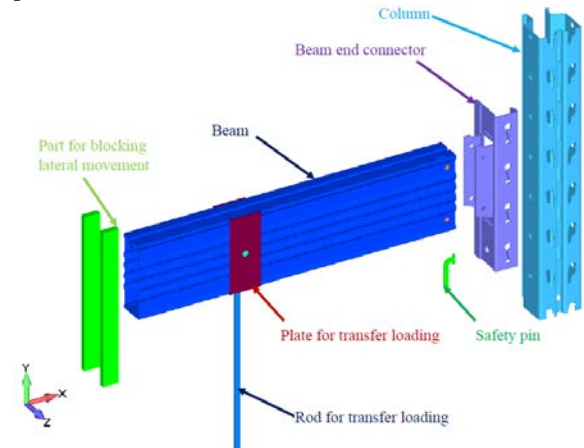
Model of cantilever test for beam to column connection of the joint S80M-R140L
